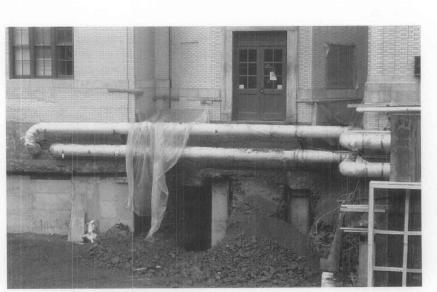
Concrete pier underpinning to an existing building may be necessary when adjacent construction occurs. In this example, pits are hand dug beneath the foundation of the historic building to provide space for wood forms. After concrete is poured into the forms, the space between the top of the pier and the bottom of the original foundation is packed with a quicksetting grout. The historic building owner should retain an independent engineer to ensure that the underpinning plan adequately protects the historic structure. Photo: Professor Arpad Horvath, Department of Civil and Environmental Engineering, University of California, Berkeley.
